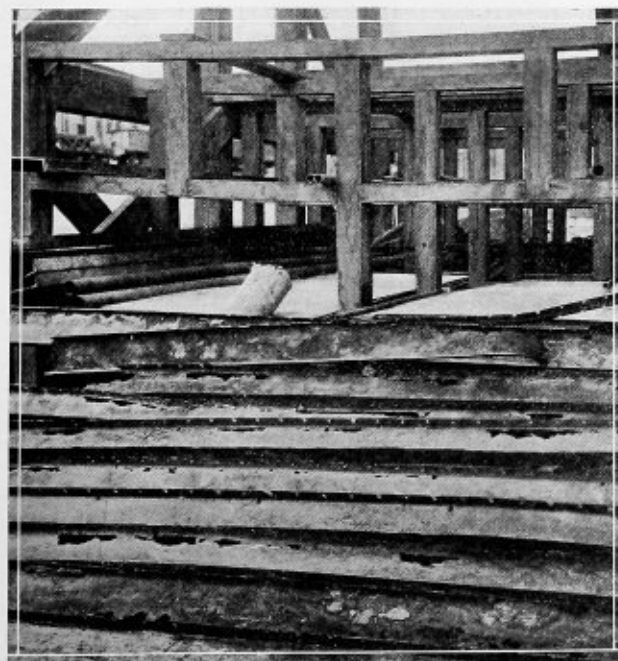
Honeycombed Roof Plates Resulting from Riveted Construction and Leaky Joints
